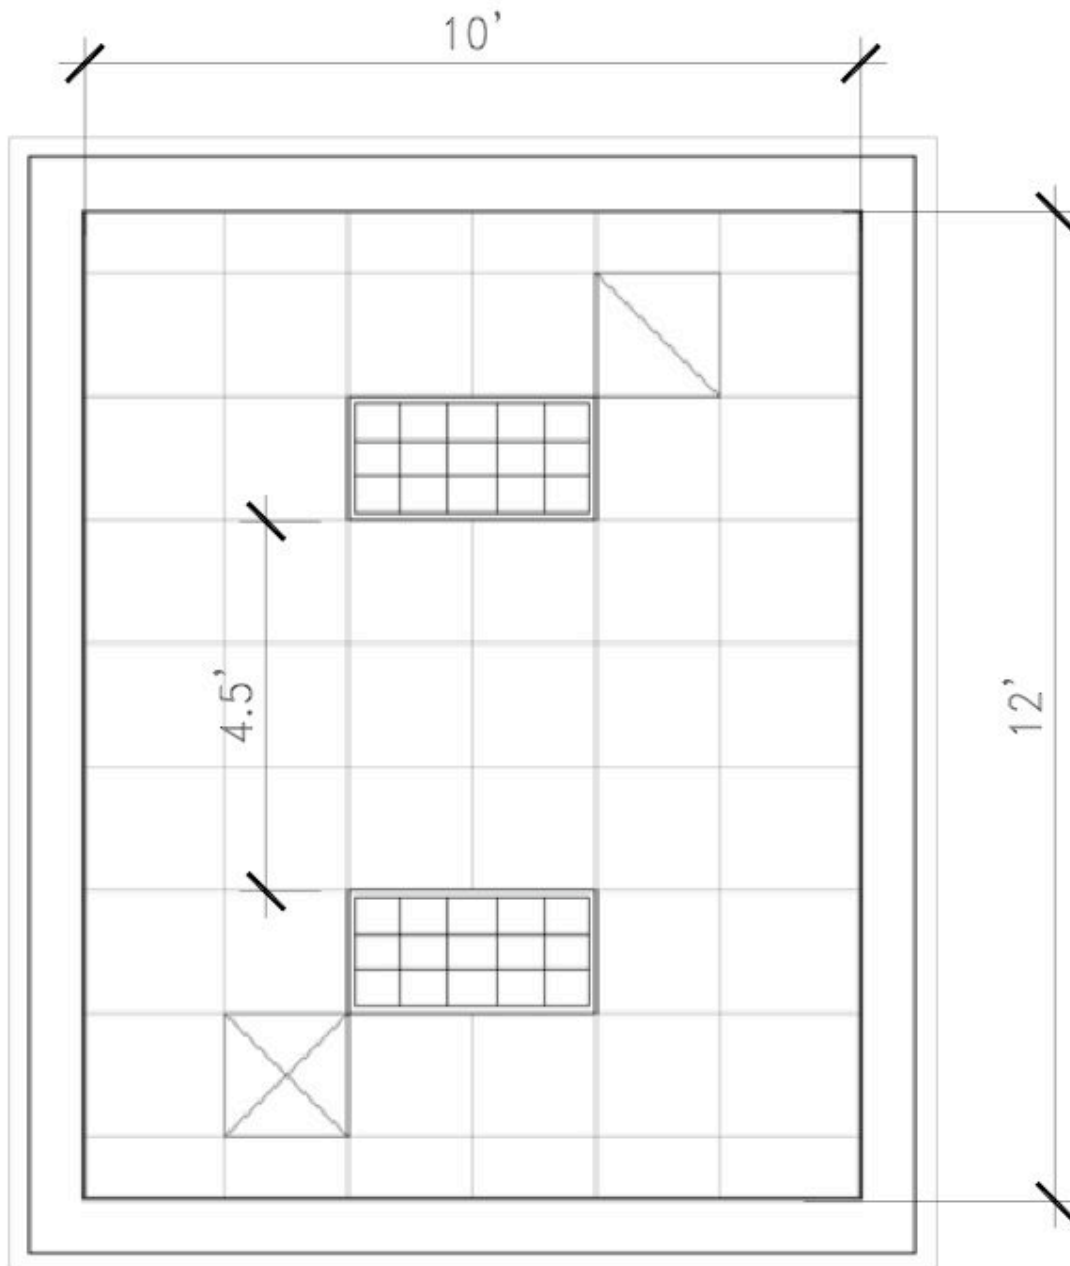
Reflected ceiling plan of the test office with Philips AltoT8 lamps
